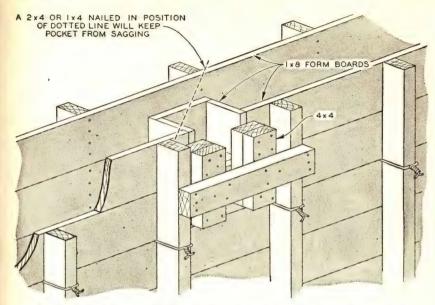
Pocket Form for Making Beam Support at Top of Concrete Foundation
